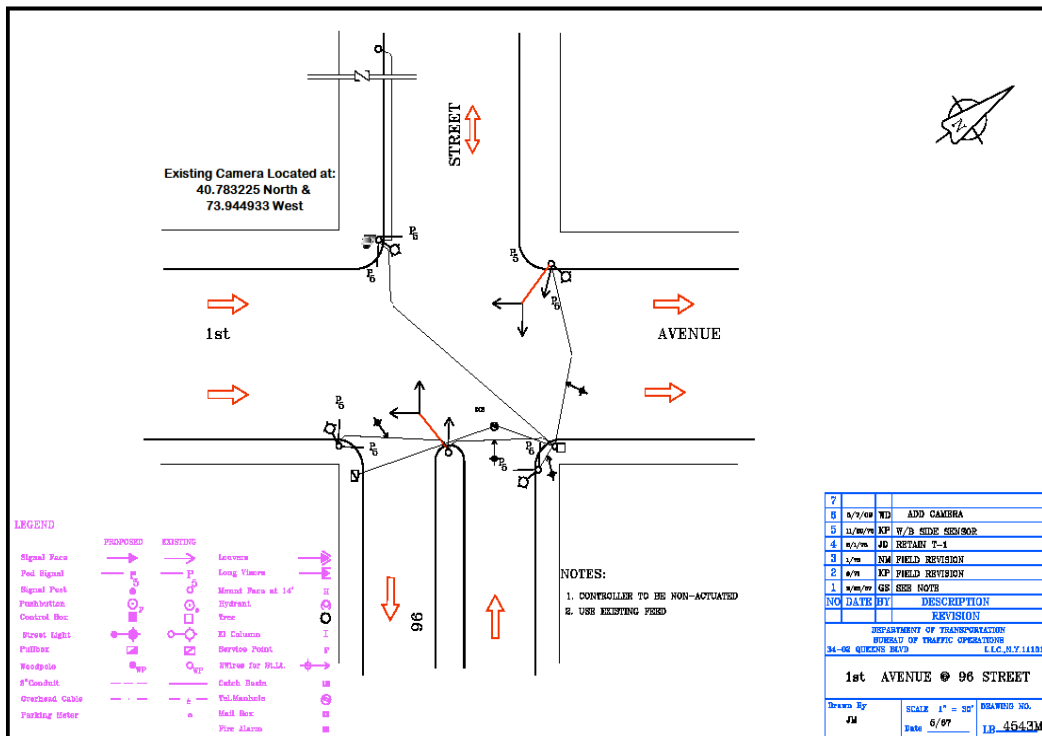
Example Initial Intersection Design Drawing, 1st Avenue @ 96th Street
